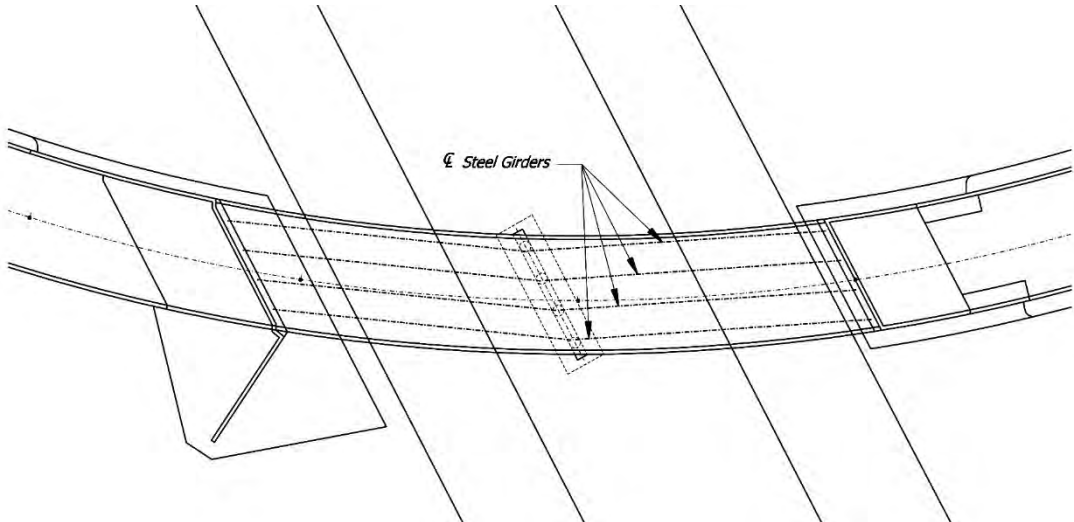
Plan view of a curved bridge with piecewise straight girders.
